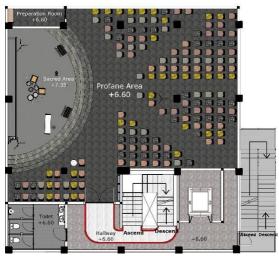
Layout Plan of Third Floor(Source: Writer, 2023)
